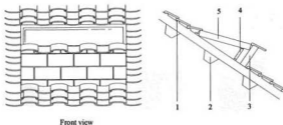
Arrangement of collector on inclined roof for optimum collector tilt angle (1 tiles, 2 inclined roof, 3 plasterboard, 4 bracket, 5 solar collector)
